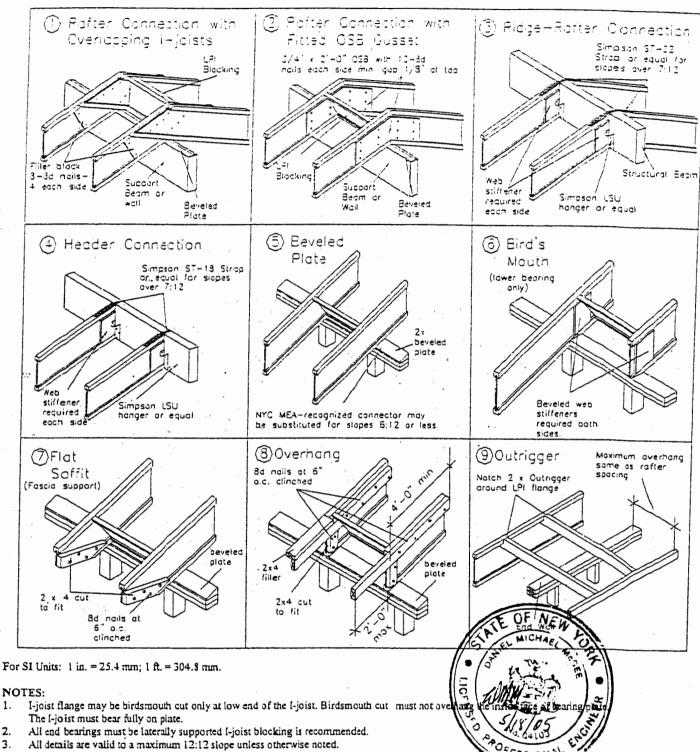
TYPICAL I-JOIST ROOF LAYOUT
